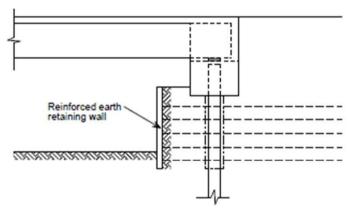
Framed abutment - with reinforced earth retaining wall
